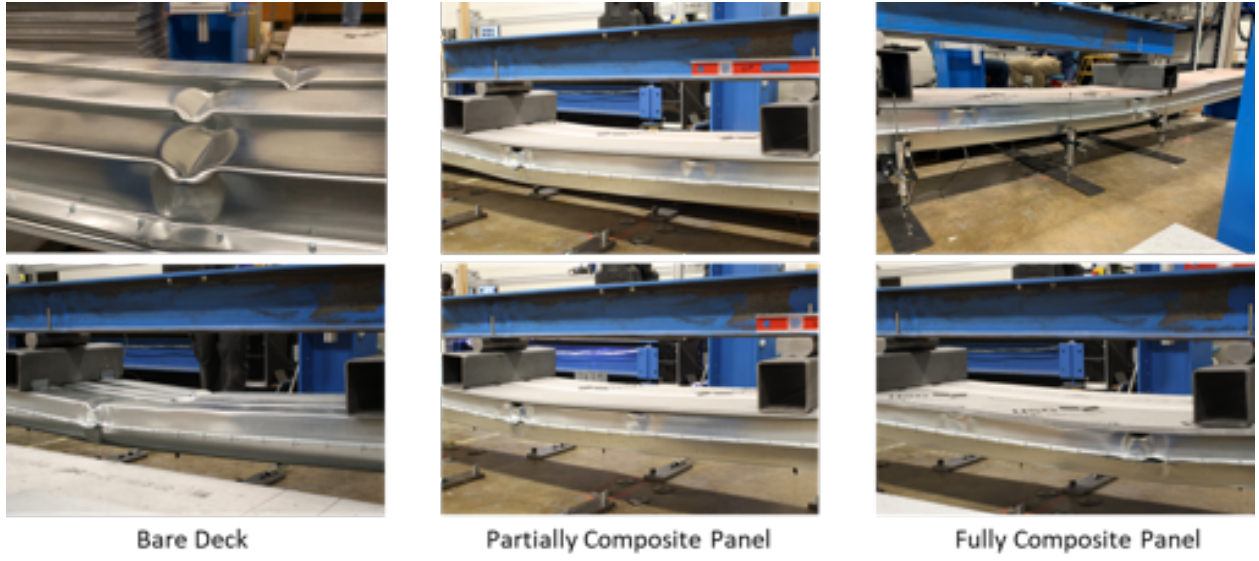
Final condition of all tests with fully composite deck-to-deck connections
